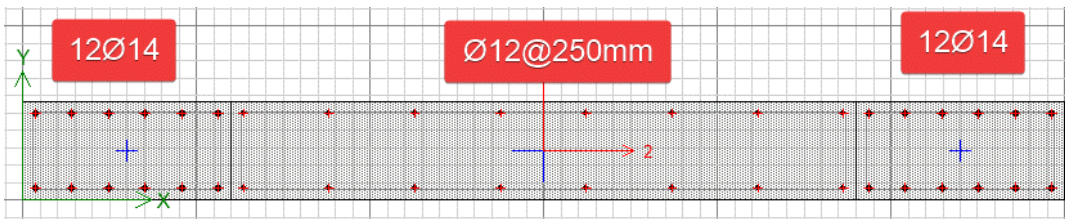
P2 (S1-S2) shear wall section reinforcement.
